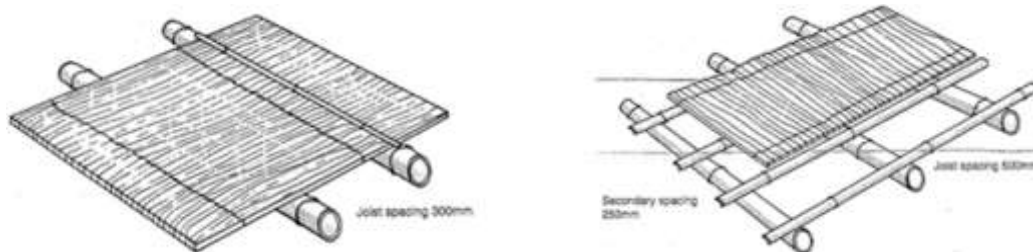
Bamboo Flooring System used in the North East (Application of Bamboo in Building Industry, 2011)
